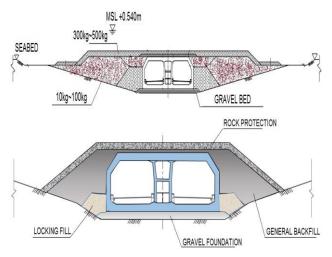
Typical foundation and backfill section (Top: Nearisland, Bottom: General section)
